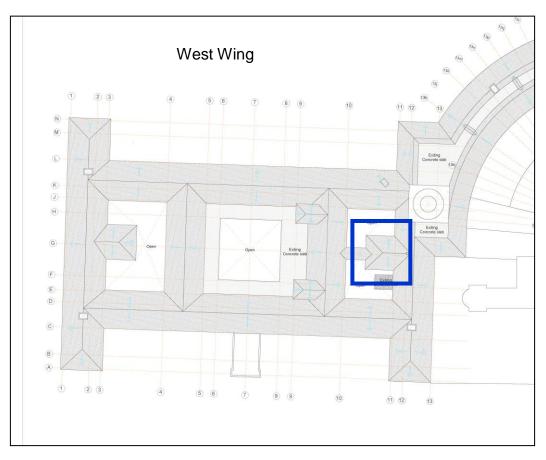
\_Union Buildings\_Overall Ground Floor Plan\_Location of Lifts in West Wing (Source: Drawing Ikemeleng Architects, 2017)
